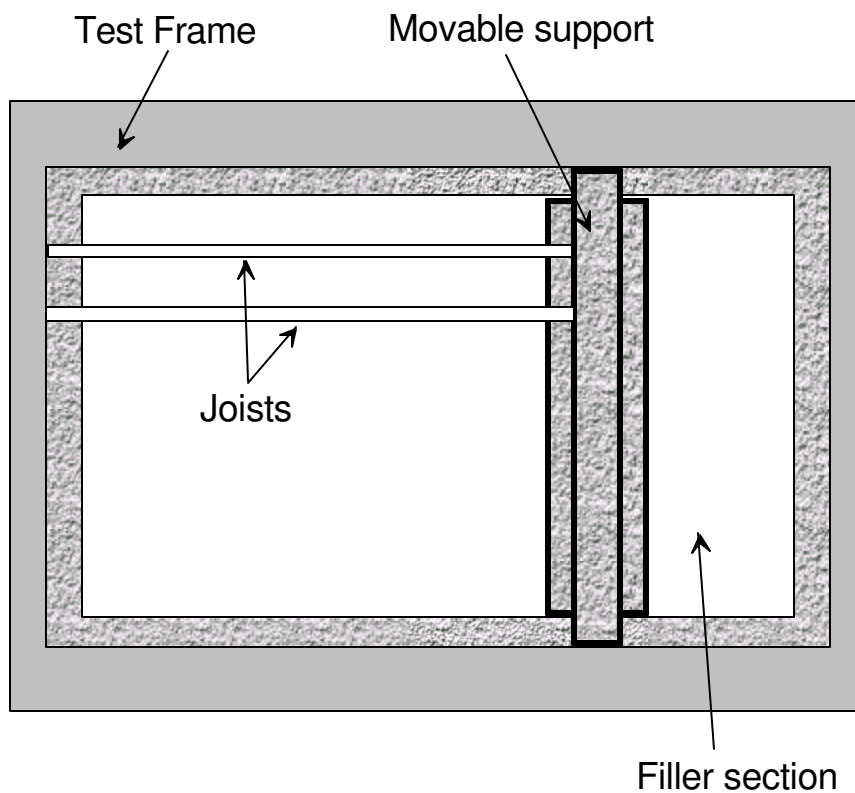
Illustration of the use of the movable concrete support when testing floors with different joist lengths.
